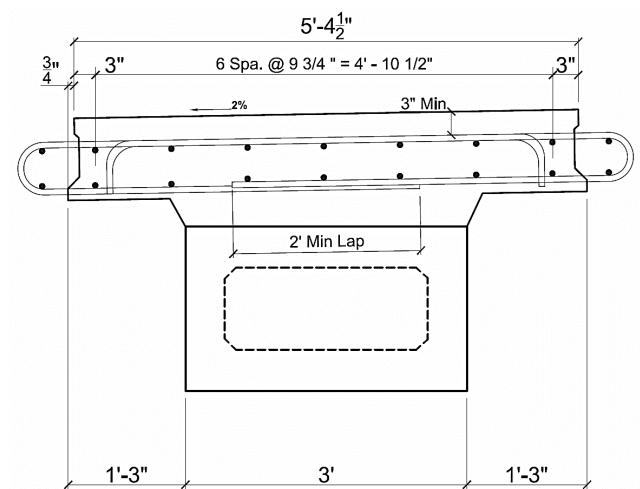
Decked box-beam section (Source: MDOT M-25 over White River Bridge plans 2010)
